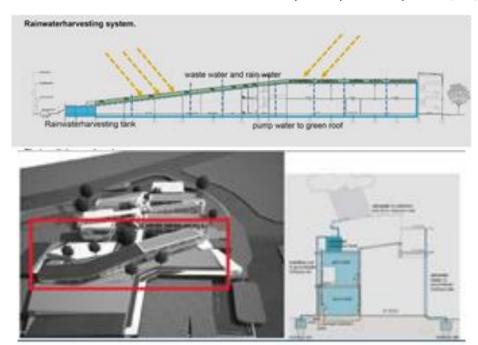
The diagram of rainwater harvesting system for the garden roof and its location in the school building.
